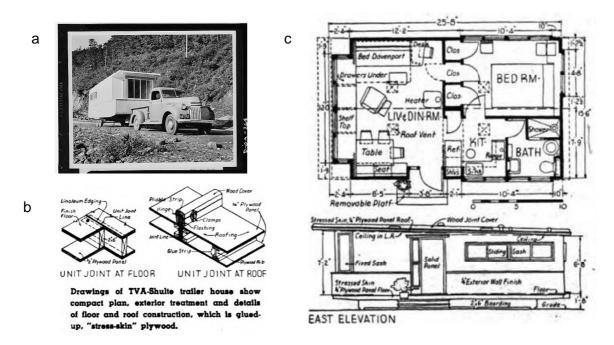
a: Tennessee Valley Authority (TVA) [15] b: TVA floor and roof details [14]. c: TVA plan and elevation [16].
